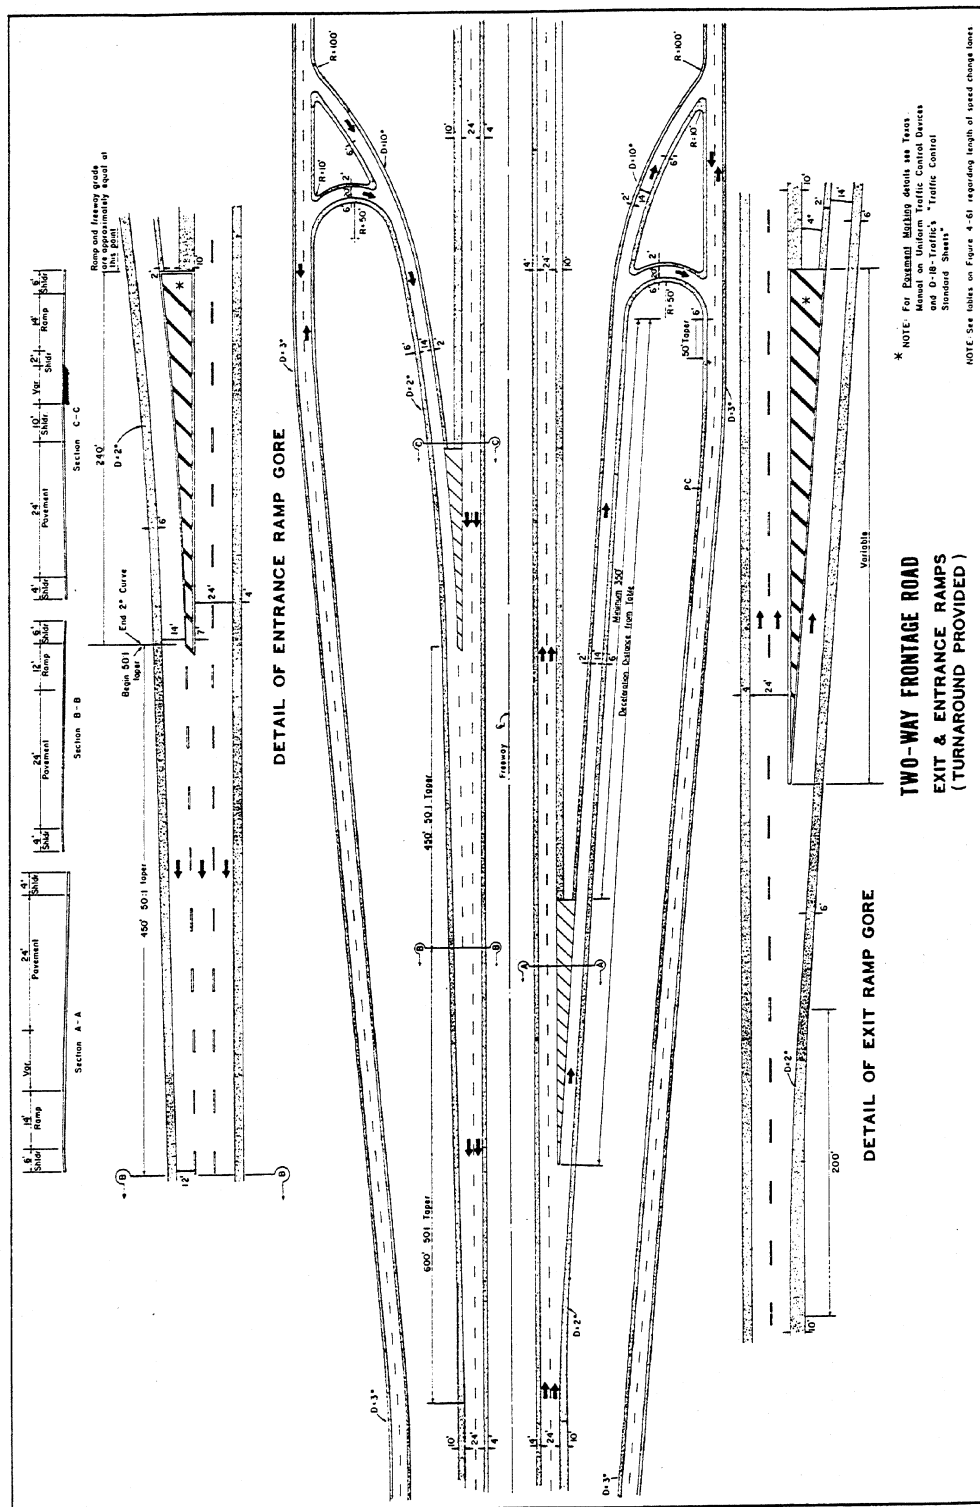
TxDOT two-way frontage road ramps with turnaround
